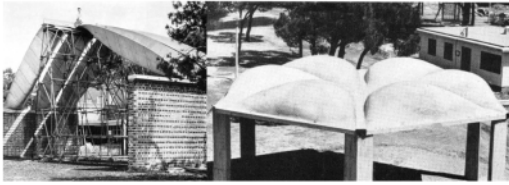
Prefabricated tri-articulated arch roof with prefabricated parts (left), roof modules made up of prestressed shells with a triangular plan (right) (Joedicke 1967).
